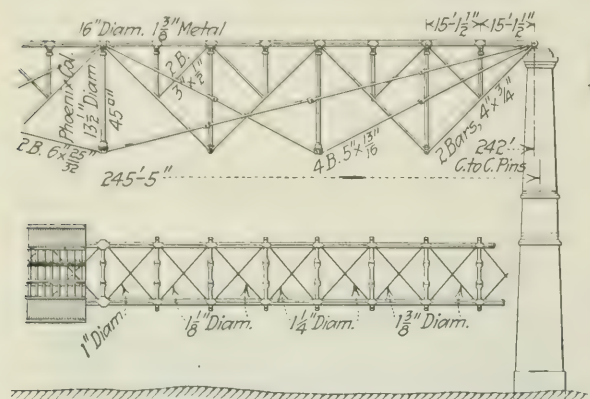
FINK DECK SPAN OF 16 PANELS, LOUISVILLE BRIDGE
